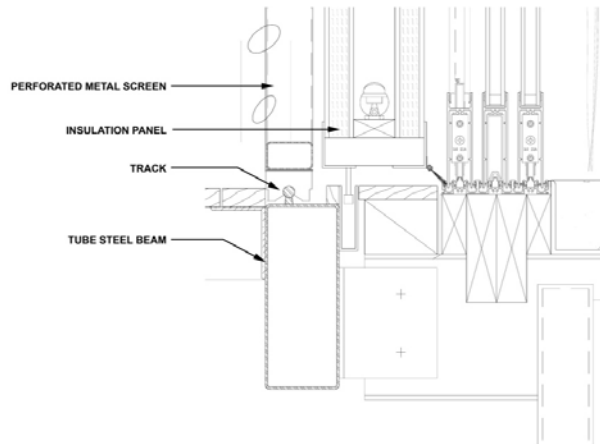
A section of the bottom details of the shading panel and its relation to the insulation panel.
